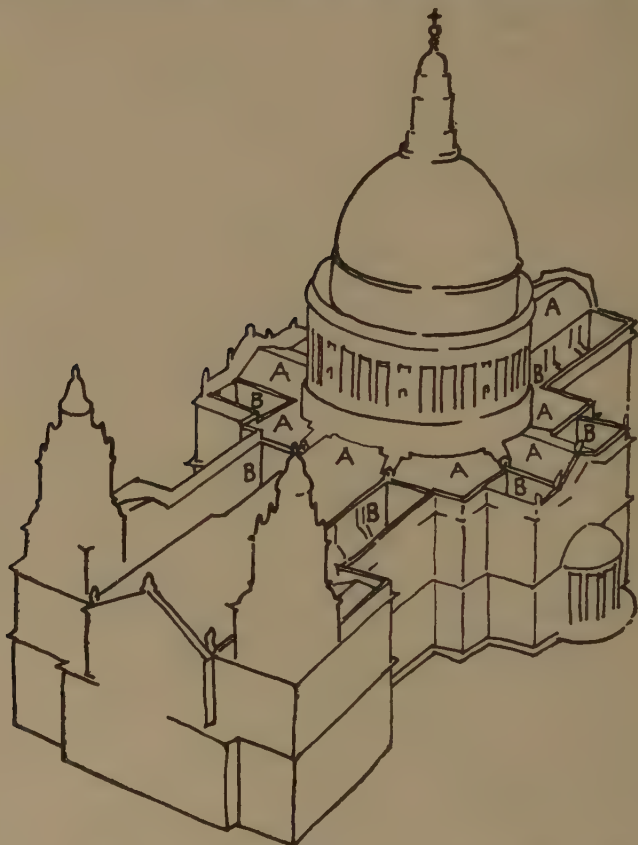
The conservator's field of operations lies in the interior of walls and piers and in the spaces between the vaults and the roofs A A, and in the areas B B, hidden between the blank high walls of the aisles.
